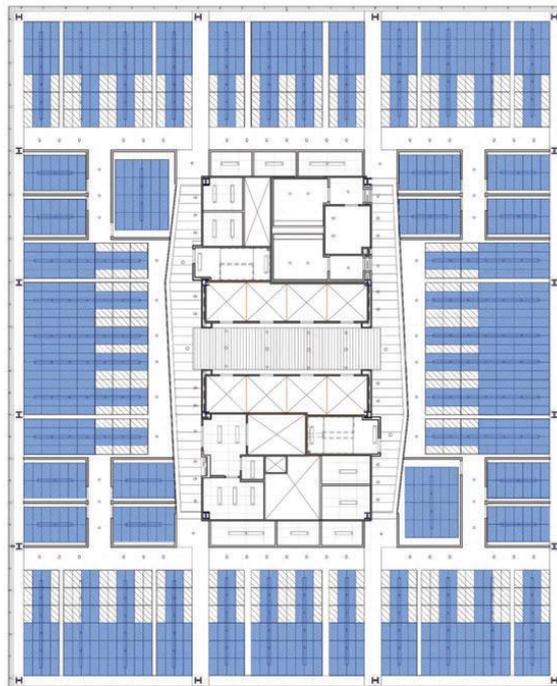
Plan of the radiant ceiling zones that, together with natural lighting and ventilation, help regulate internal air temperatures (Source: SERA Architects & Cutler Anderson Architects).
